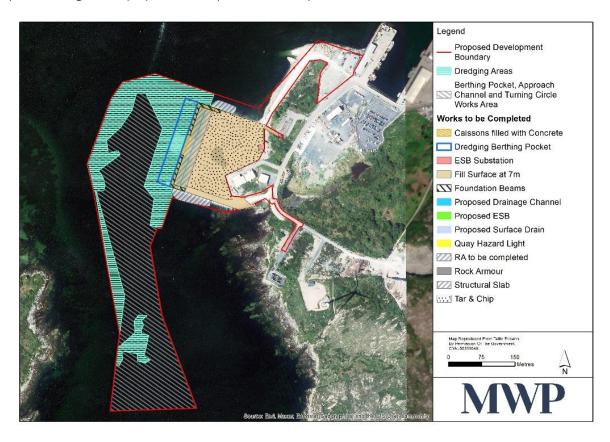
Proposed Development Boundary including the reclamation and quay wall works area and the marine dredging areas in the channel (cyan hatched shading).
